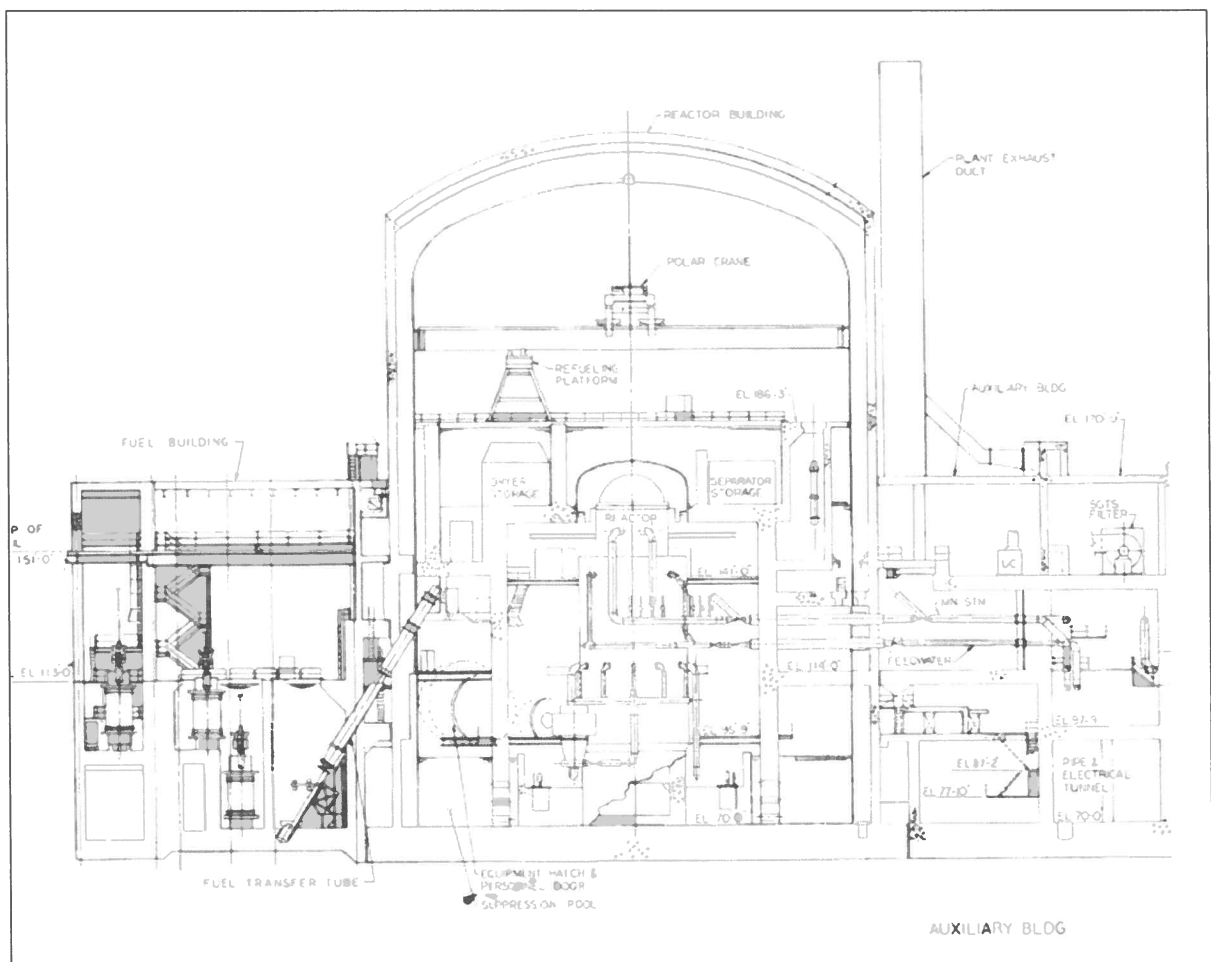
Reactor Building, Fuel Building, and Auxiliary Building Elevation Drawing. Source: NRC n.d.
